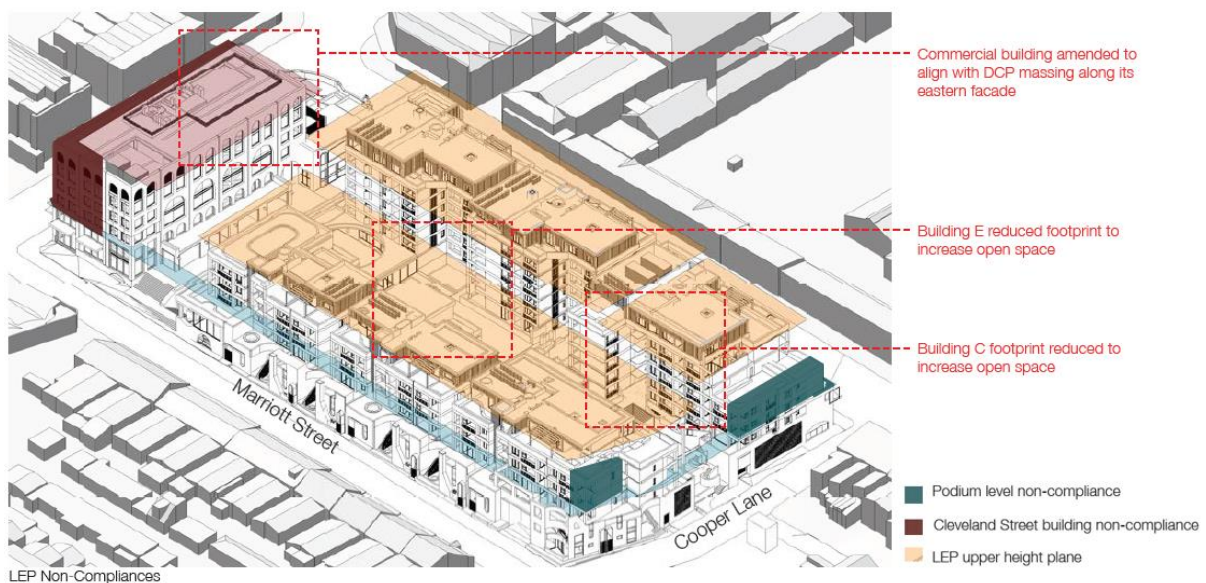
The height standards as they apply to the building envelope of the site - Marriott Street / laneway view.
